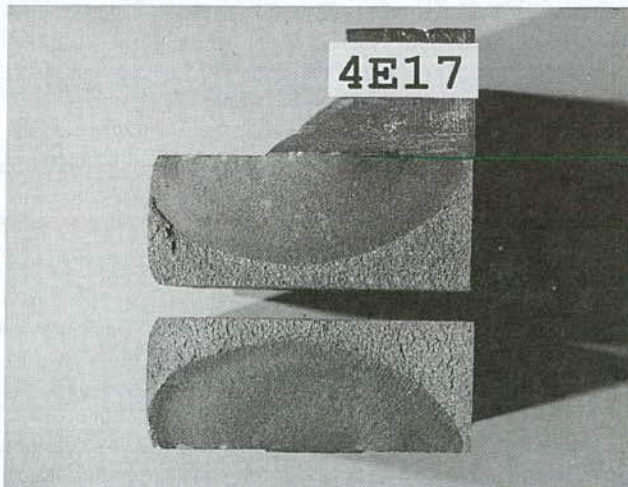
Fatigue crack at cover plate end weld detail 4E17.
